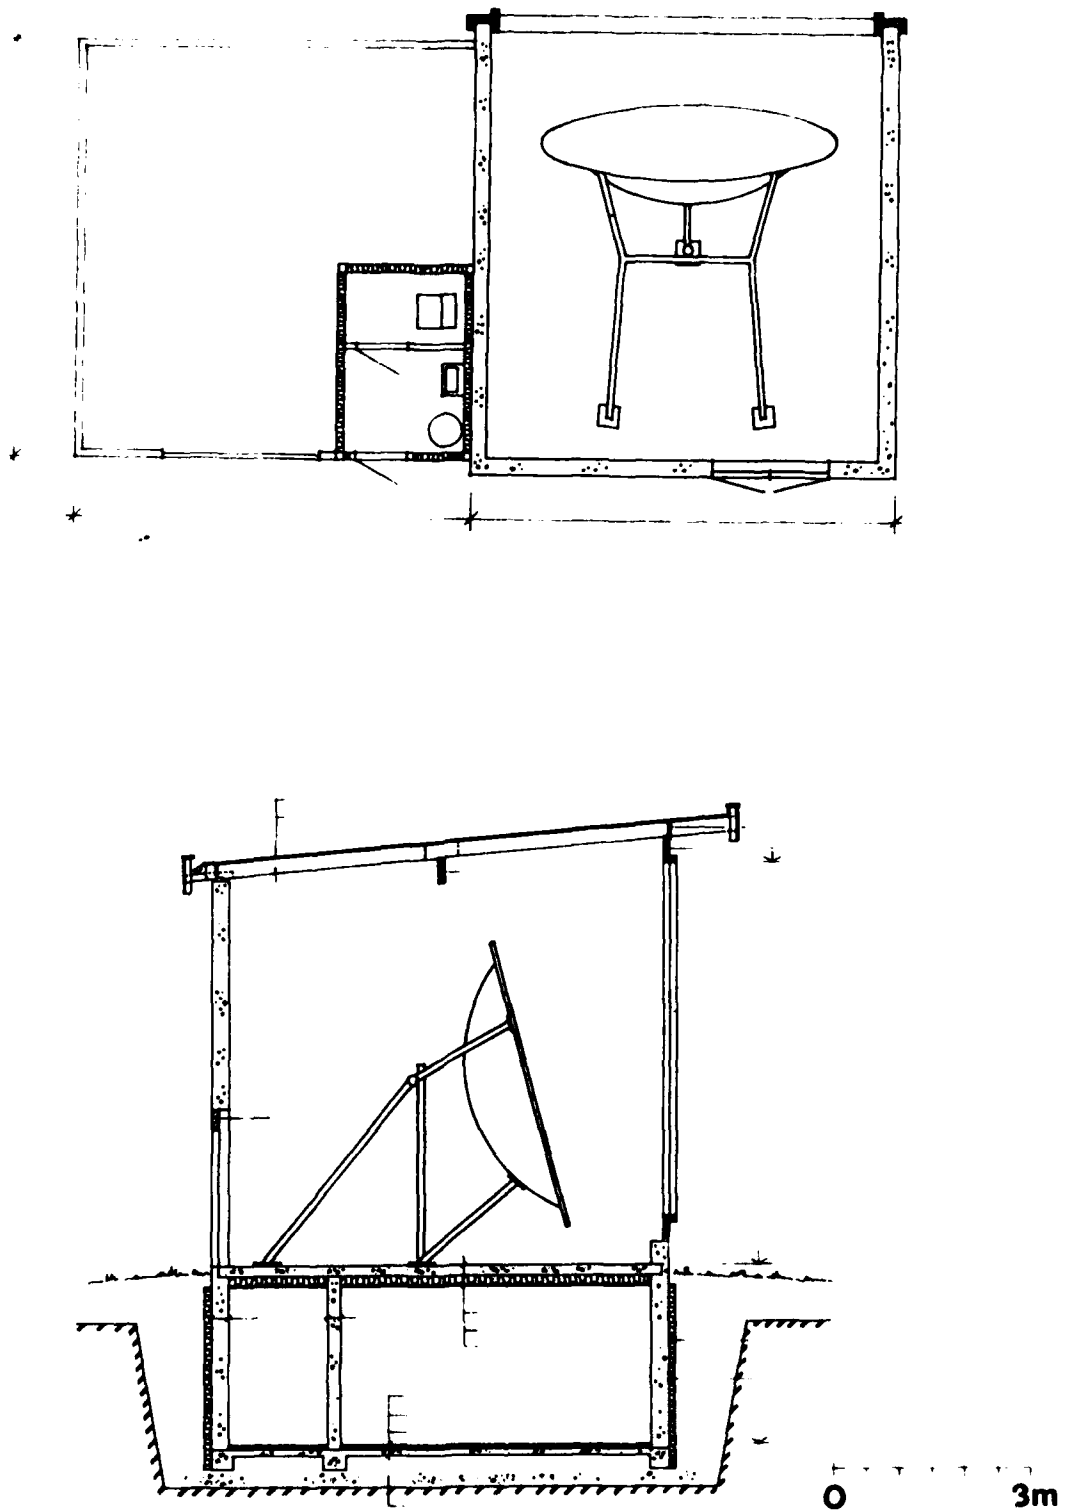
The central terminal building. Top: Top view showing the antenna room and an adjacent storage room. Bottom: Cross section with underground rooms for electronic equipment and central processors.
